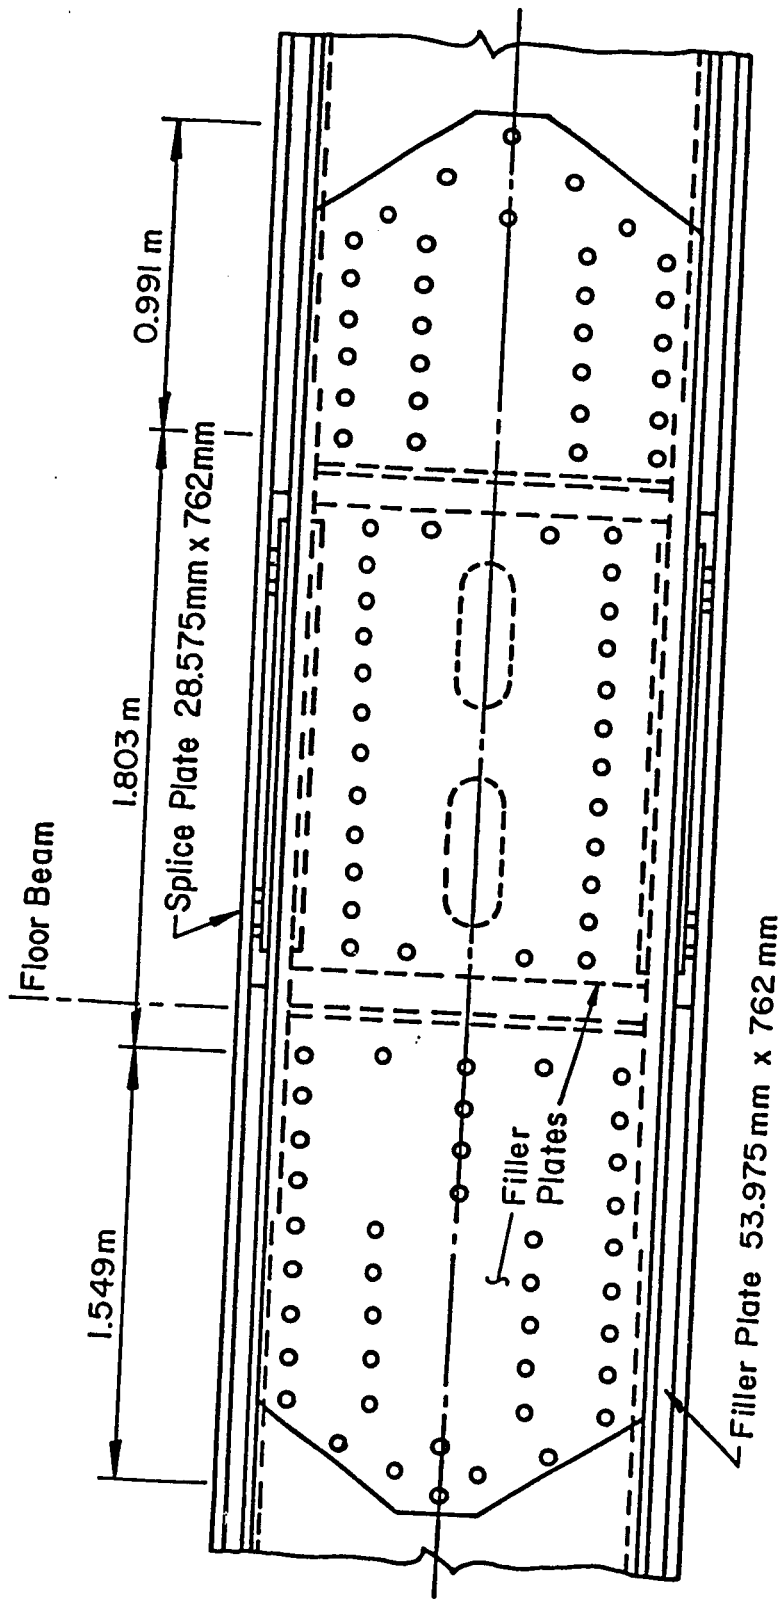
Plan of the Typical Retrofit Detail for Spliced Panel Points on the T-beam Girder
